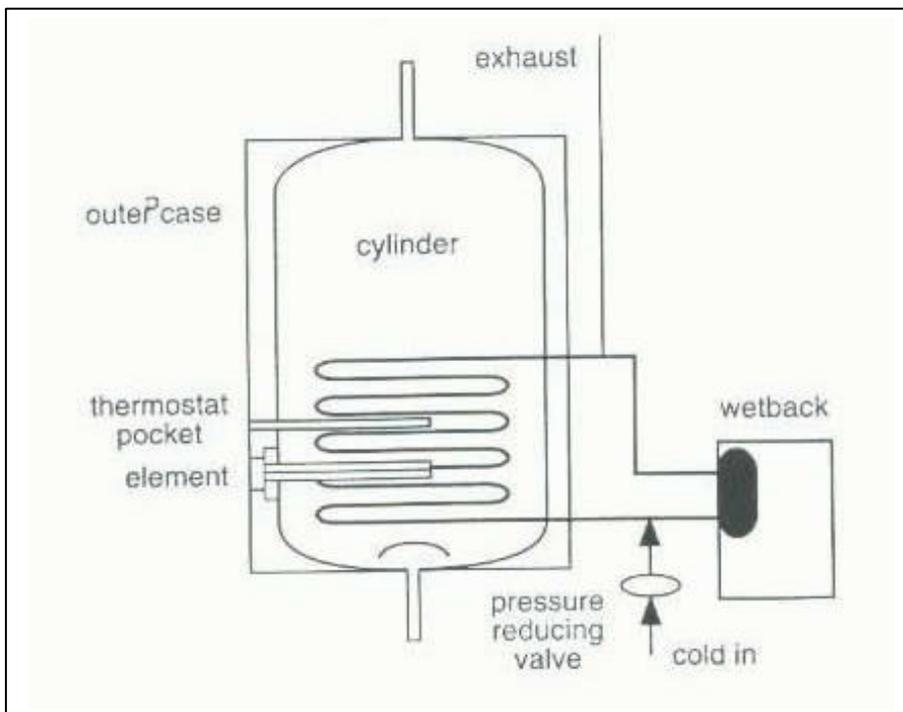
(b) Indirect wetback installation with pressure reducing valve
